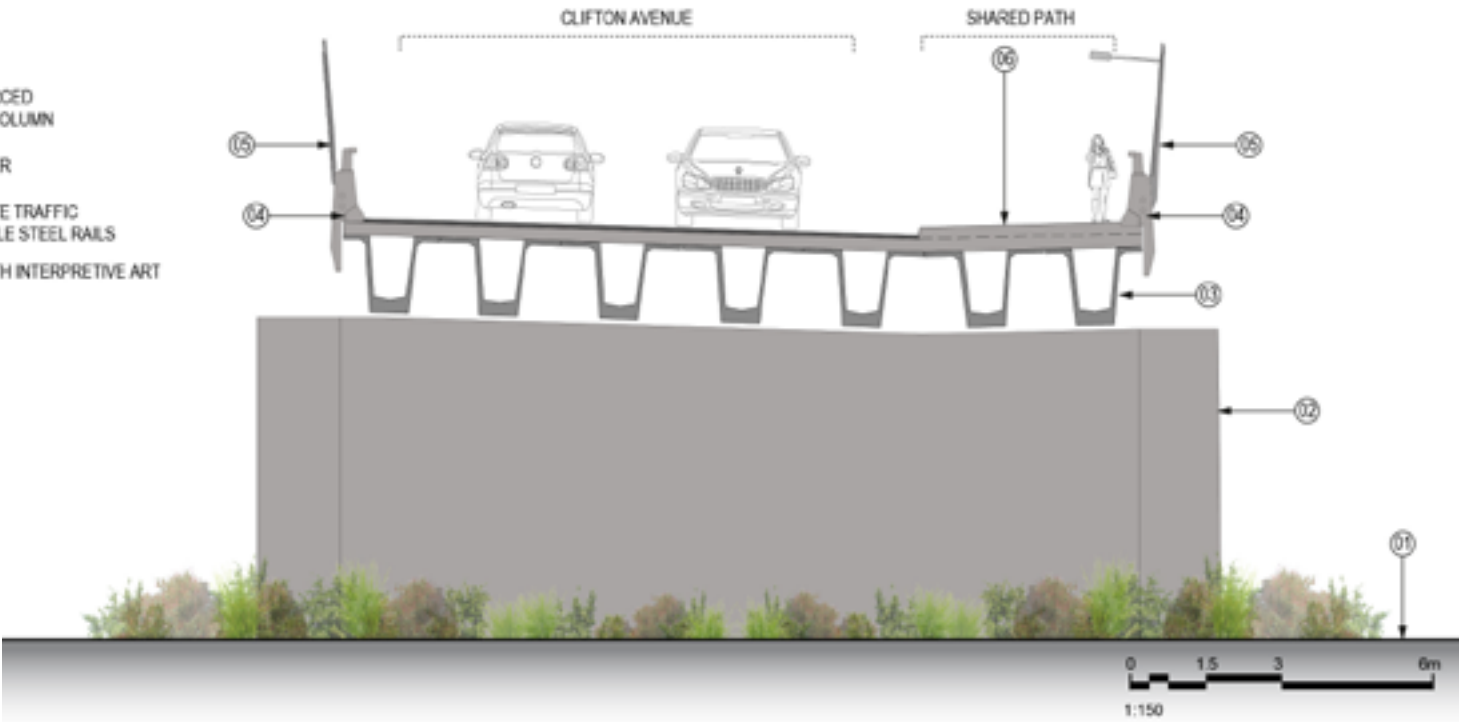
Section - BR02 - Bridge over Clifton Avenue
